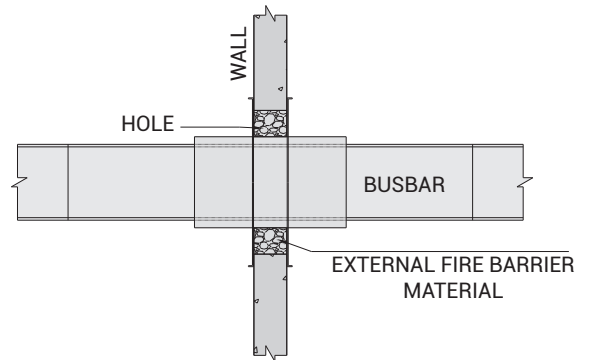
SAMPLE WALL CROSSING WITH FIRE BARRIER
